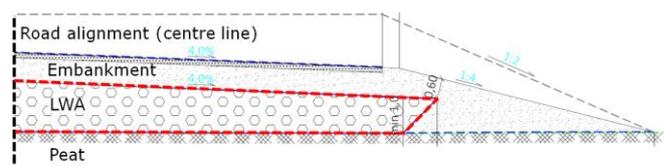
Cross-section of test section 4. Light weight aggregate (LWA) layer.
